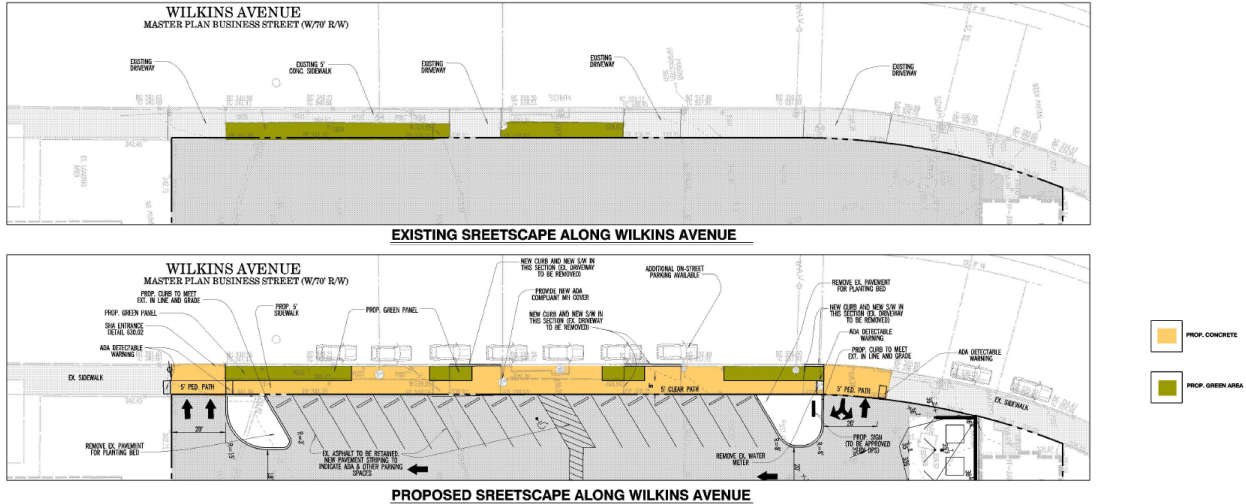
Wilkins Streetscape Plan 'Alternate B'
